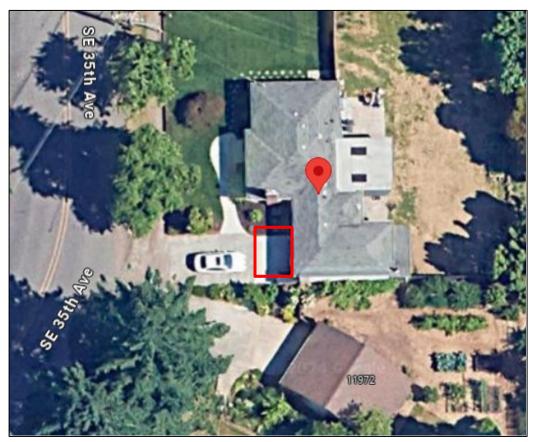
Aerial photo of property with the location of the proposed addition outlined in red
